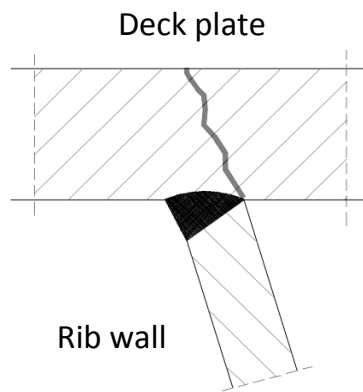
Cracks in deck plate at the rib-to-deck weld
